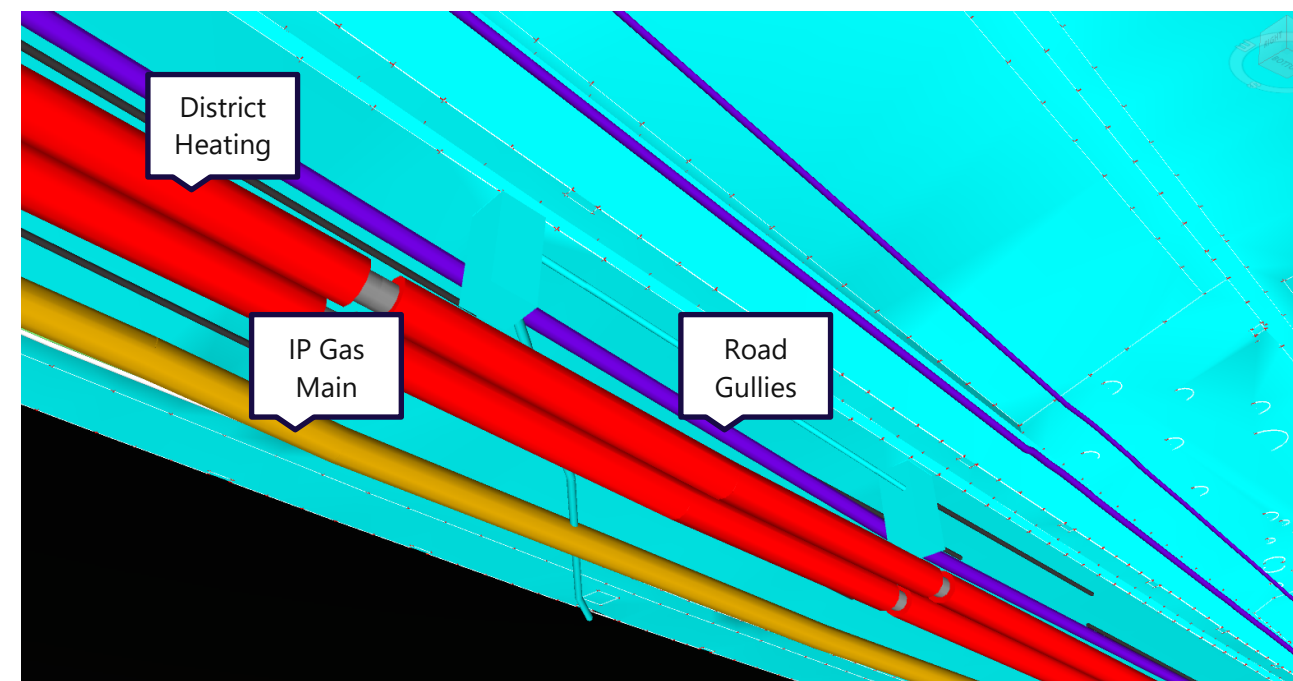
Pipework passing beneath Surrey Canal Road Bridge
